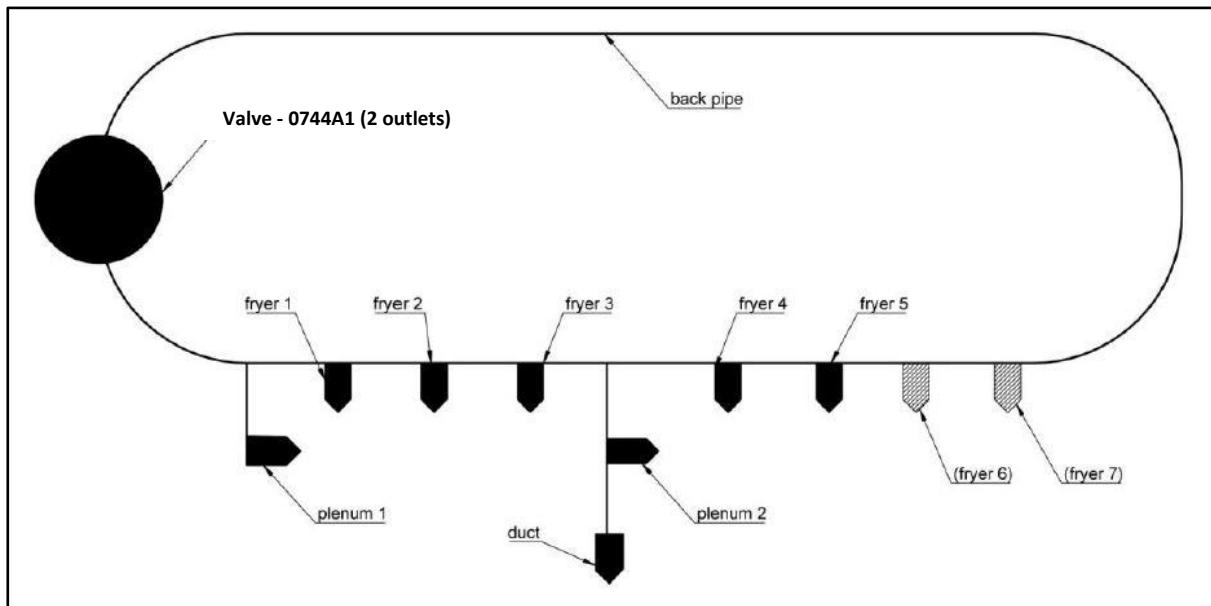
Typical and basic scheme for piping layout of System “Grande”
